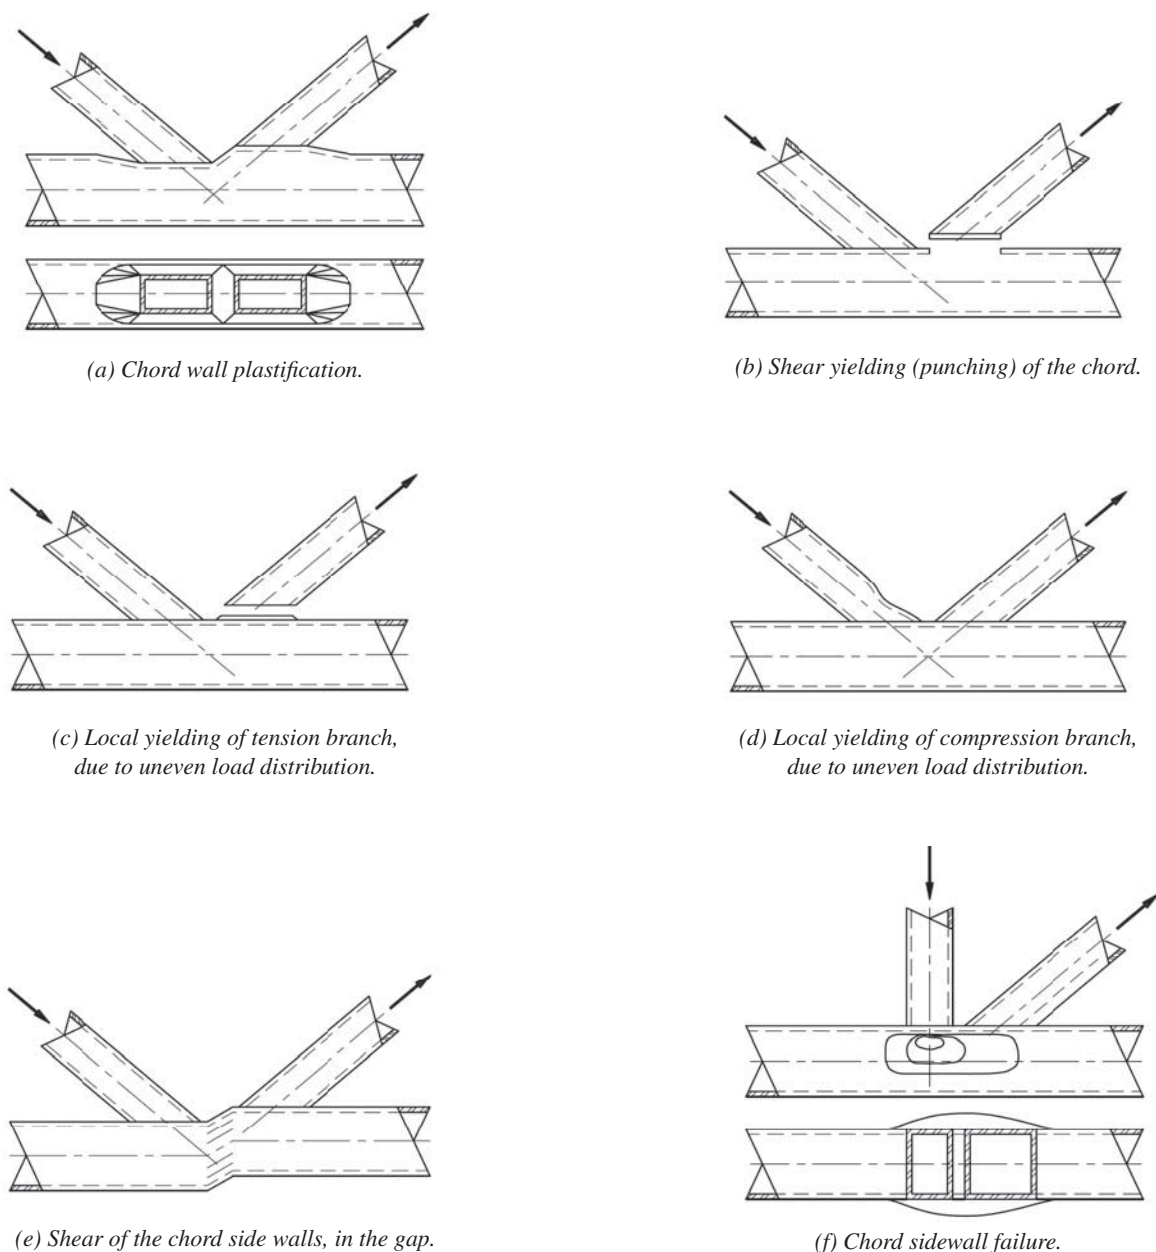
Typical limit states for HSS-to-HSS truss connections.
